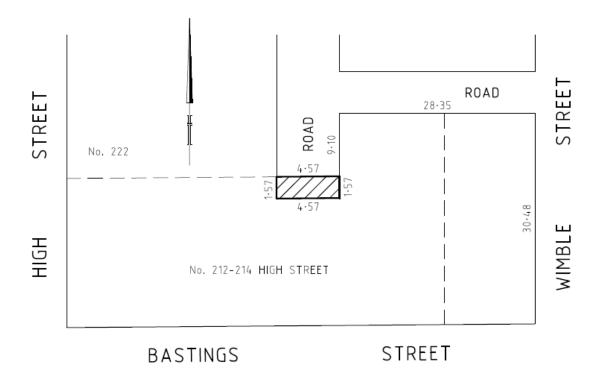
Title Plan road adjoining 212-214 High Street, Northcote
